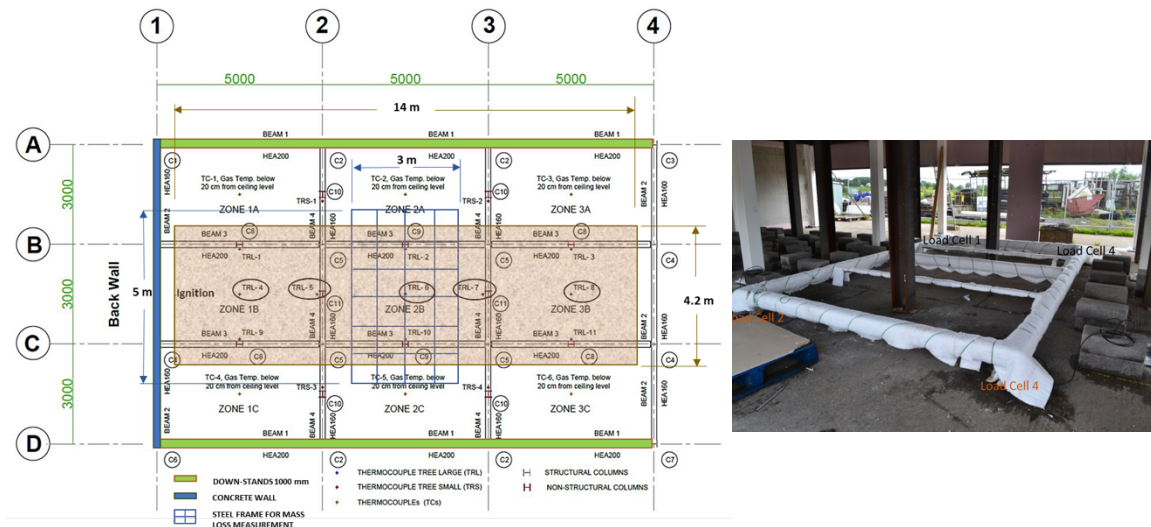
Fuel load arrangement and steel column provided in the test compartment.
